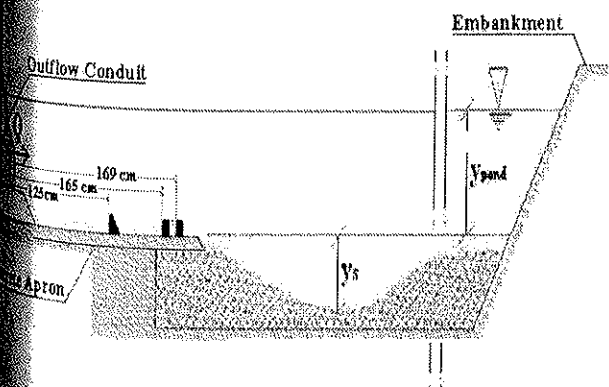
Longitudinal section of the water retaining structure (pond) and energy dissipation system (not to scale)
